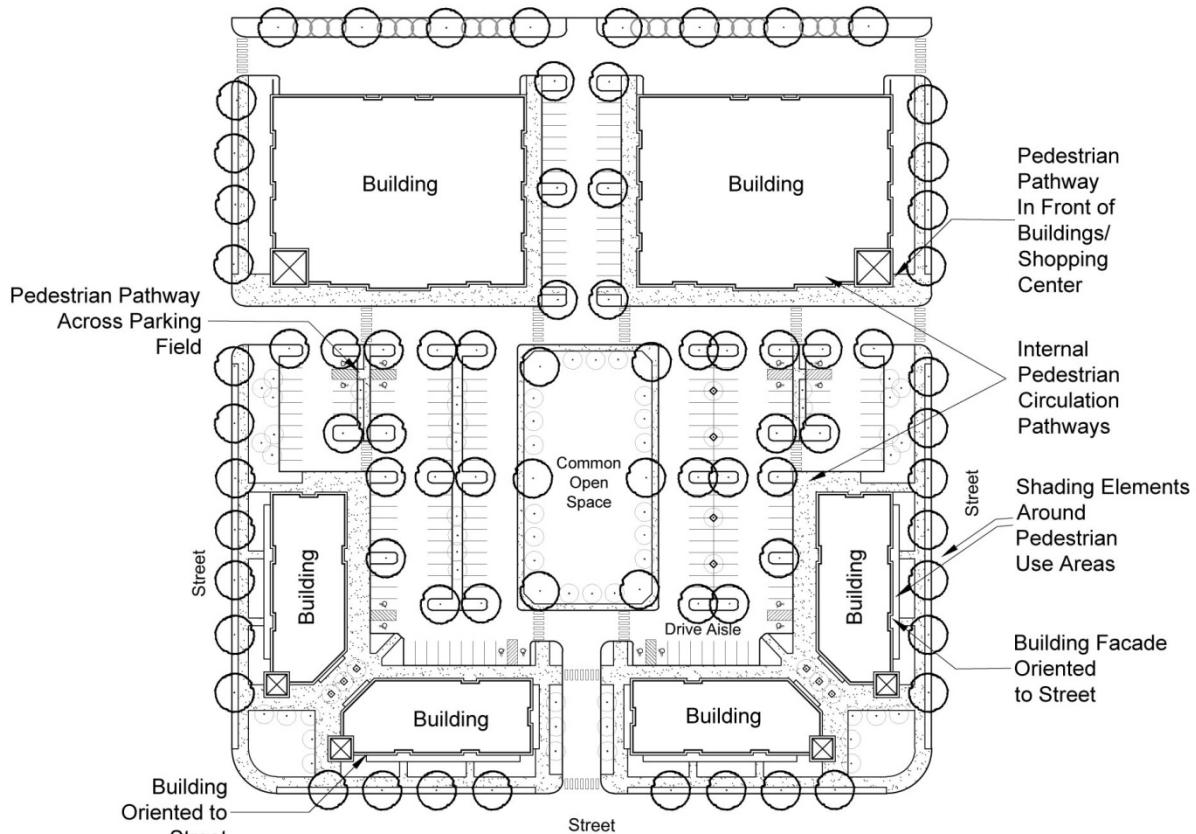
(d). – Site Layout – Pedestrian Design Standards
